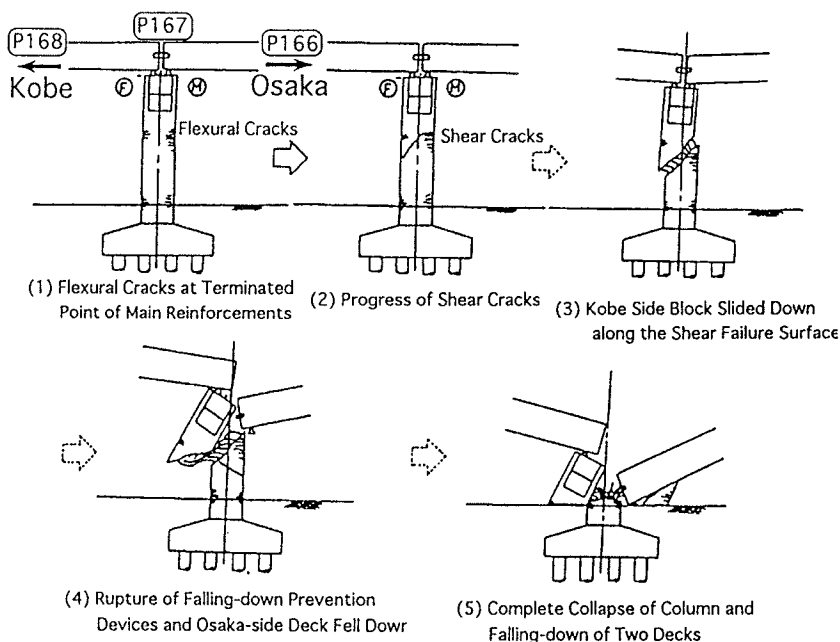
Failure Mechanism of Highway Bridges at Takashio, Route 3, Kobe Line of Hanshin Expressway
